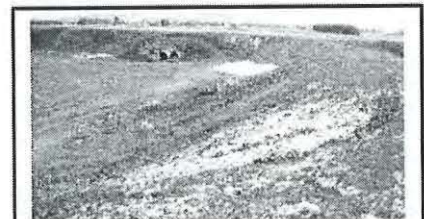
looking SE at 3 corrugated steel culverts in berm
